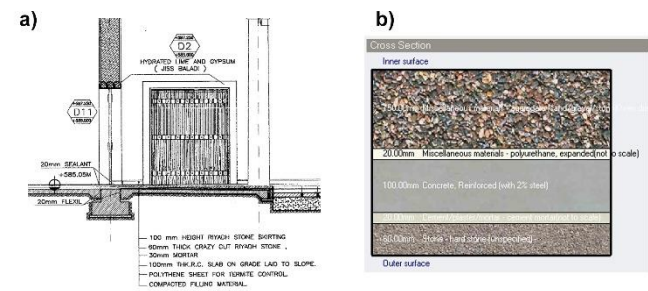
Ground floor layer: a) as built detail, b) design builder data entry ground layer.
